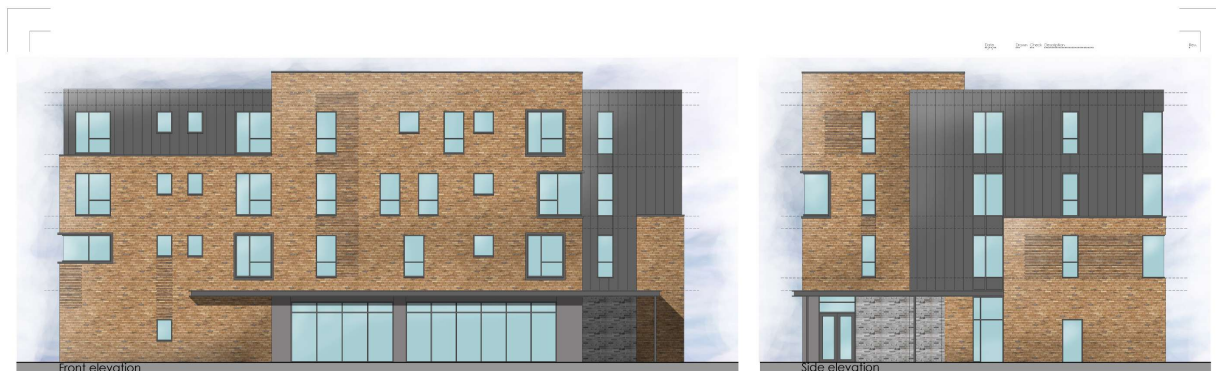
Proposed elevations and material composition. Source: C2J Architects, AL(00)17.
